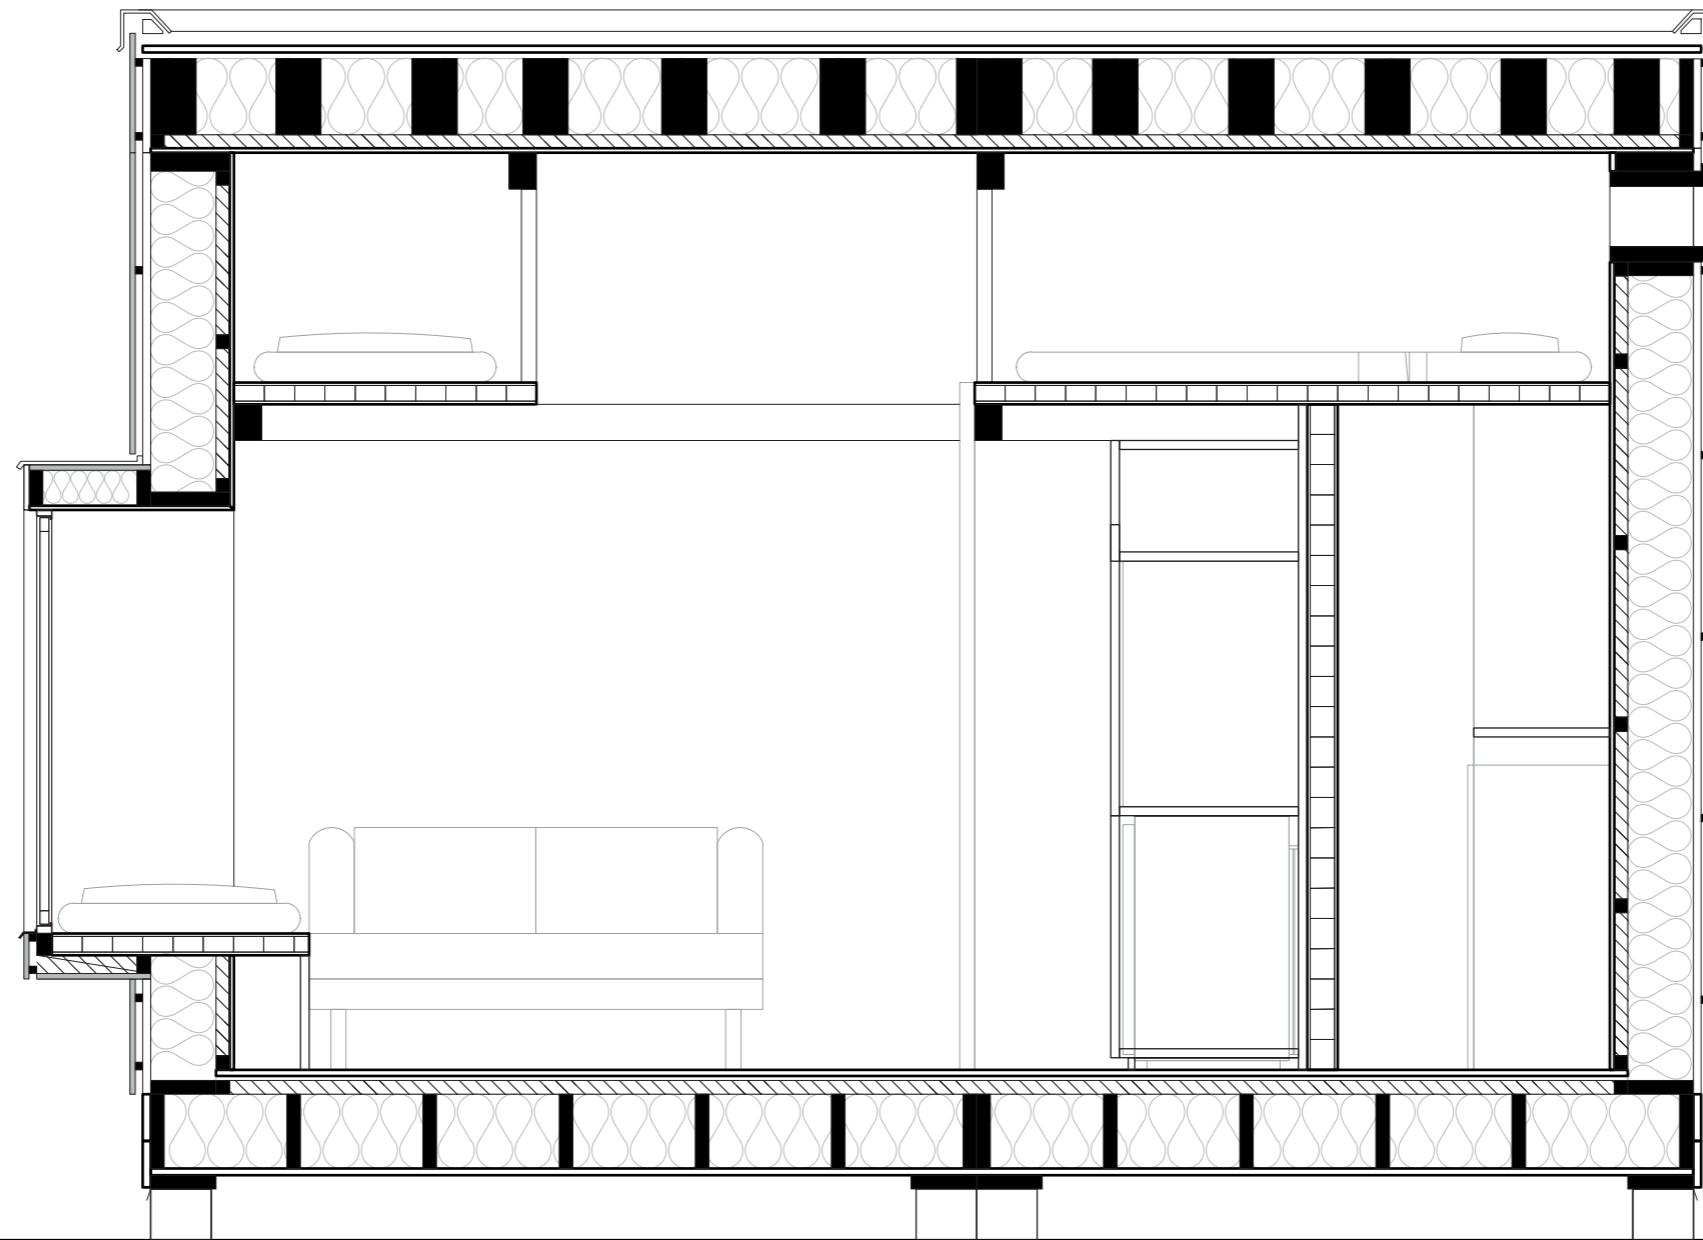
Section C SC 1:25 [AutoCAD and Illustrator]
